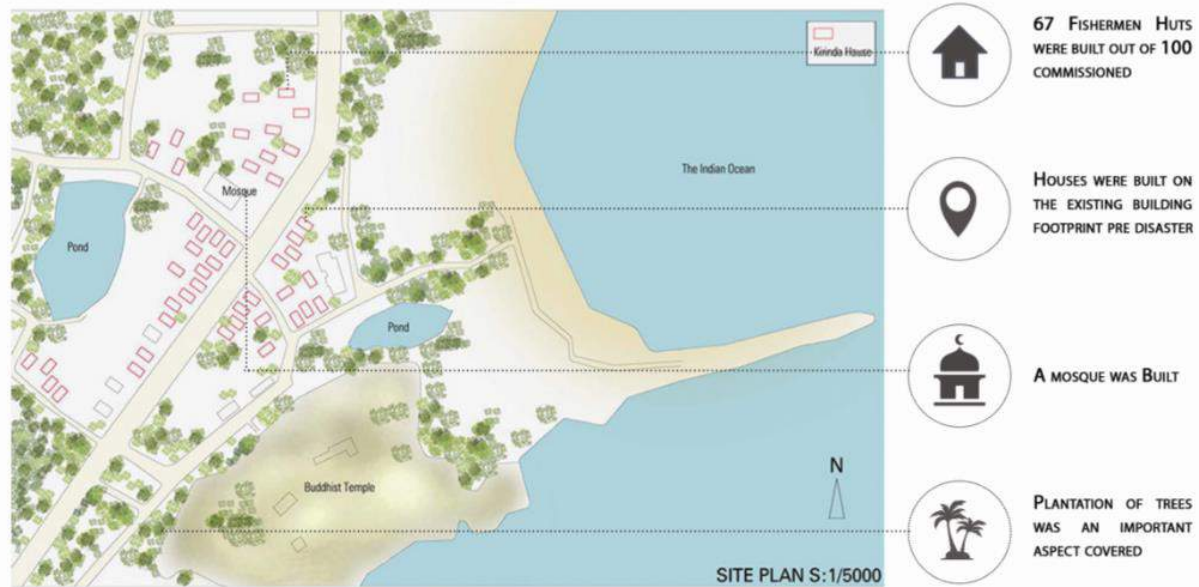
Site Planning of Kirinda (Source: In-Habitat)
